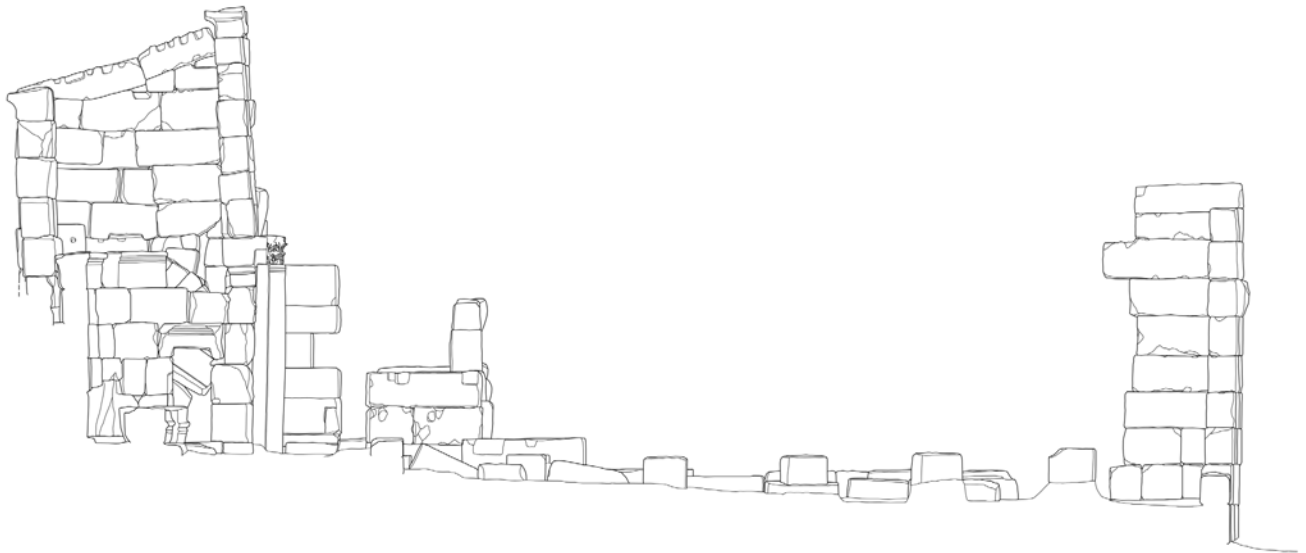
Digital traced side elevation plan (northwest outer wall)
